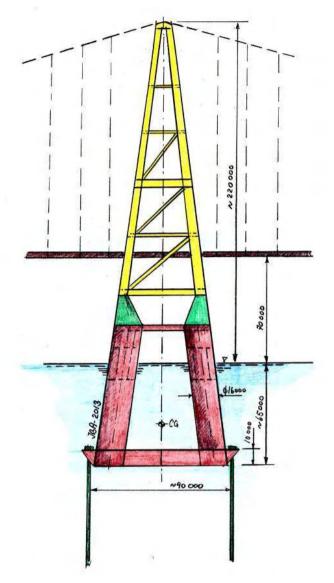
Proposal of a "TLP foundation" used as foundation for bridge tower. DESIGN AND FABRICATION OF A "TLP FOUNDATION"
